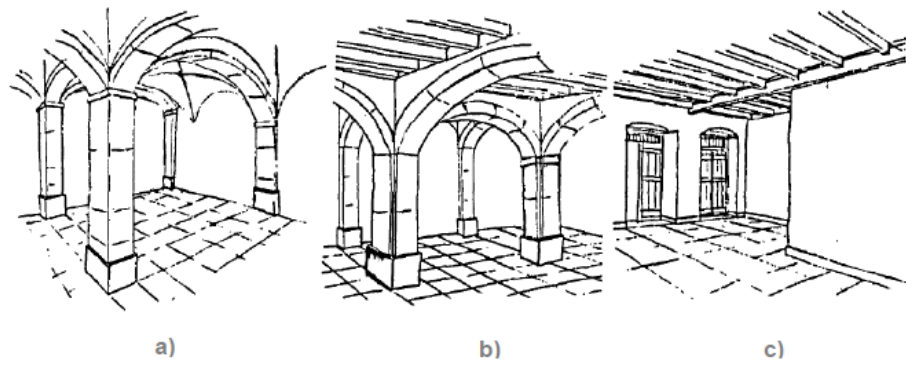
a) Vaults and Arches; b) Arches and timber beams; c) Timber beams on walls (Dias et al., 1996)
